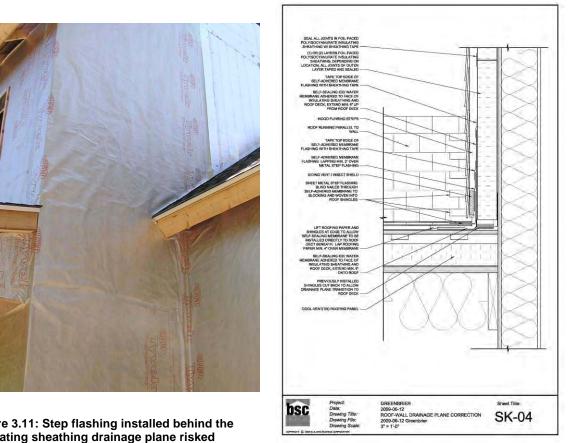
Step flashing installed behind the insulating sheathing drainage plane risked injecting water into the wall assembly
